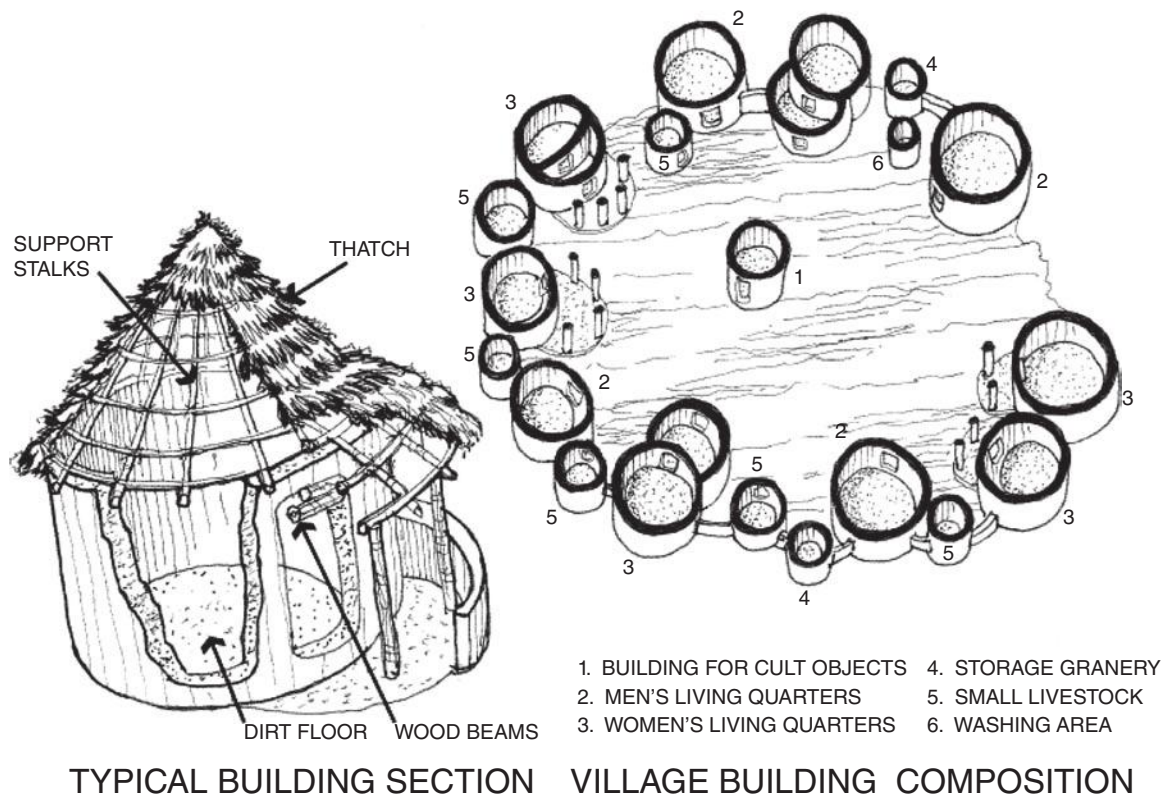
These sketches depict a typical dwelling unit of wood and clay, and a collective arrangement of the types of structures mingled together for a group of people.
